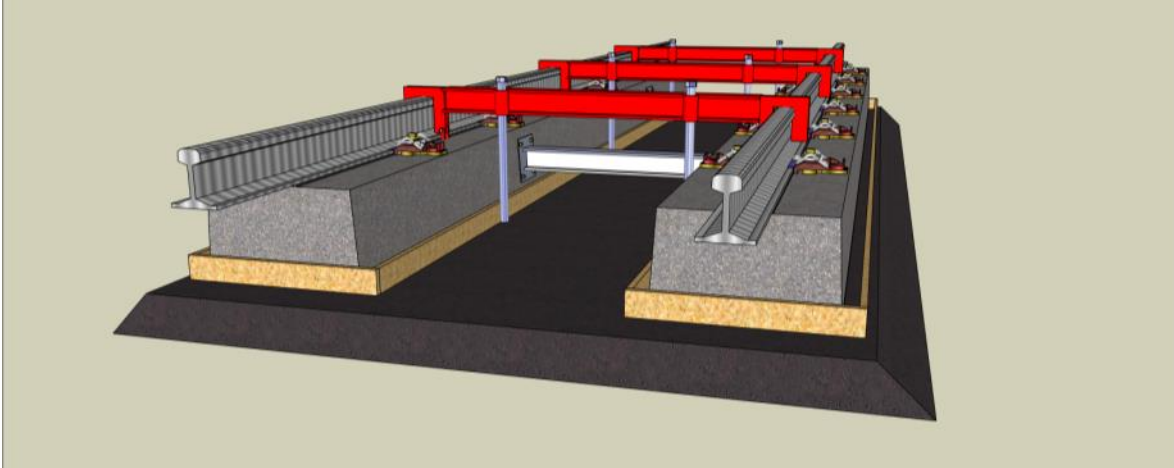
INSTALLATION OF MORTAR BED FORMWORK
